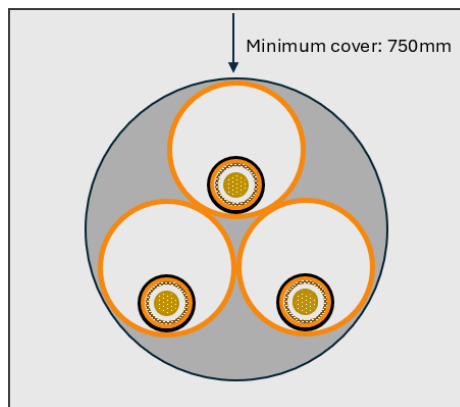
Trefoil installation of transmission cables in underbore with touching conduits.
